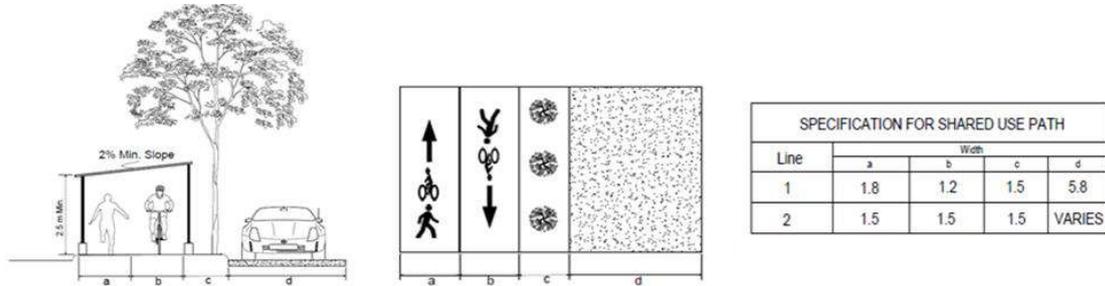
Elevation Plan and Top View for Design of Shared-Use Path (dimensions in meter)
